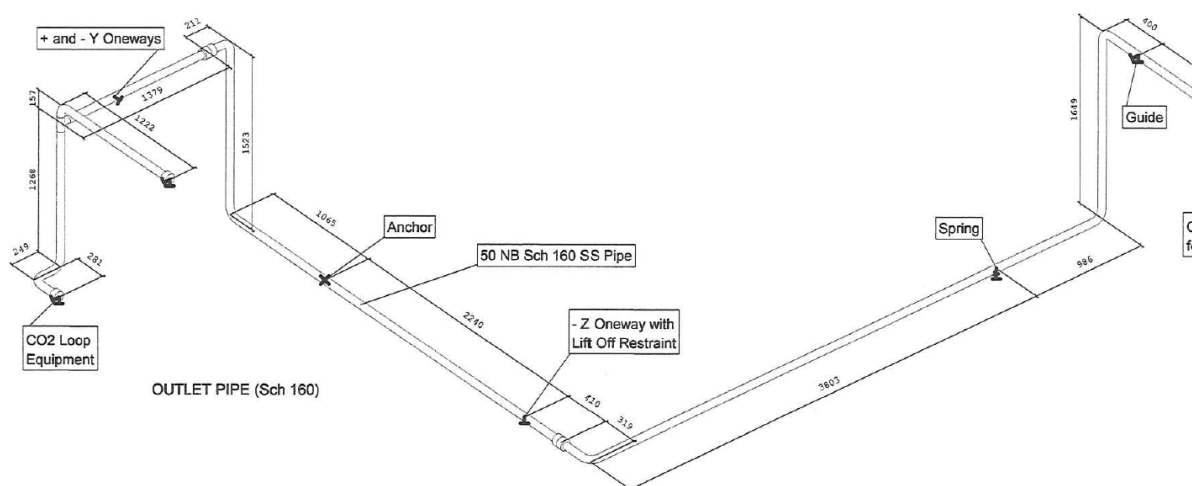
Layout of fixings for the pipes connecting the heater outlet to the turbine inlet
